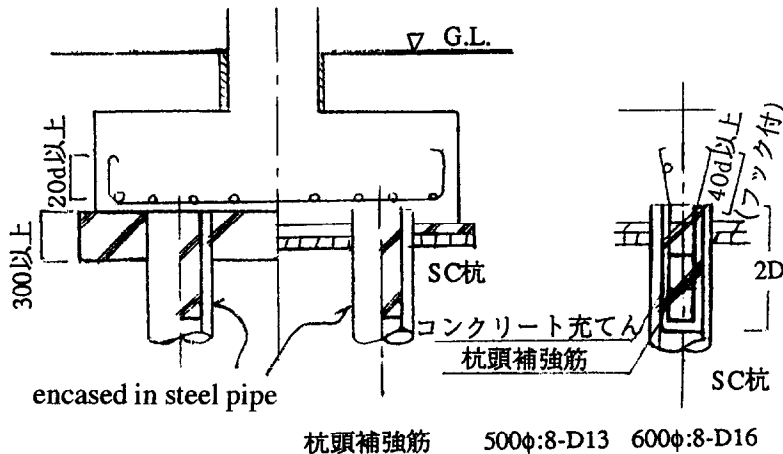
Detail of connection between pile and pile cap encased in steel pipe.
